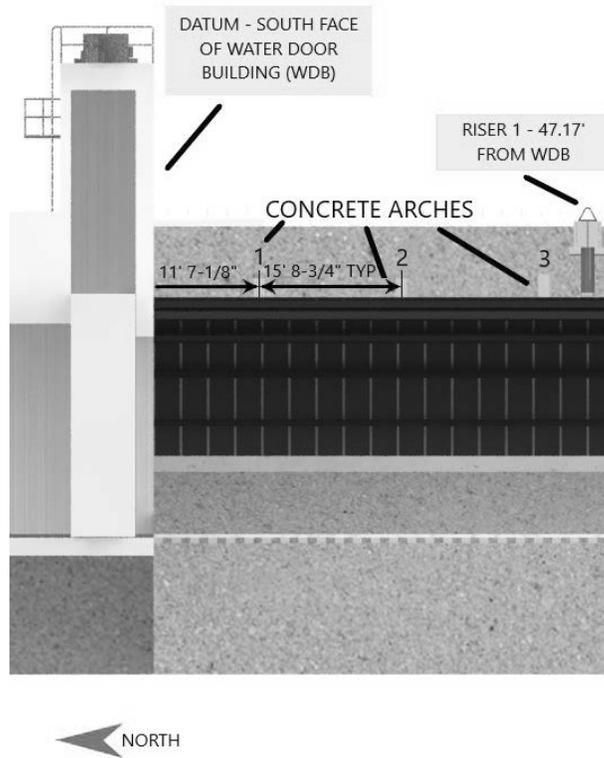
Water Door Building to Riser 1 Tunnel Section.
